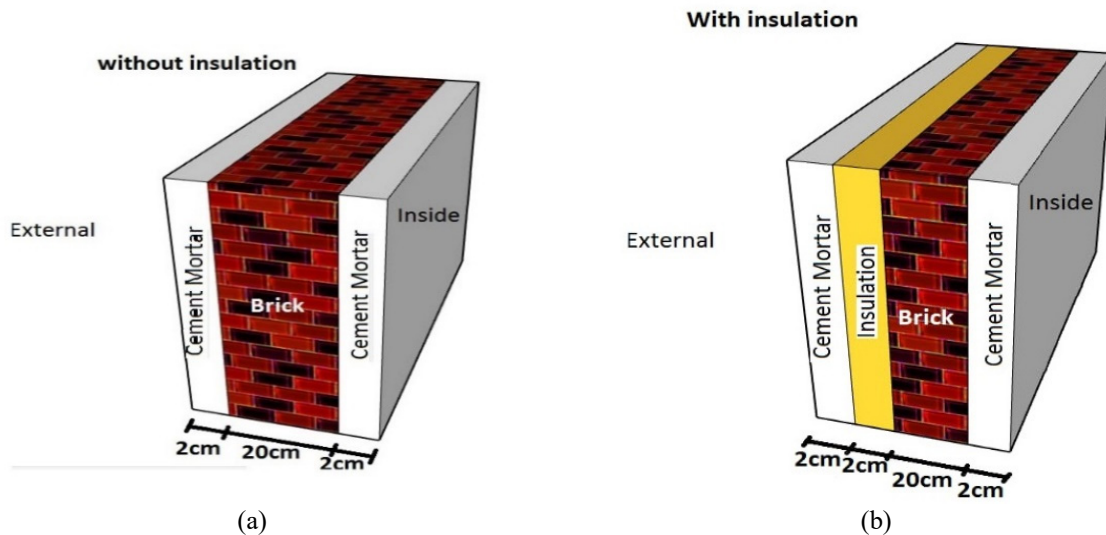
(a) Wall Multilayer Building Plan without Insulation, (b) Wall Multilayer Building Plan with Insulation
